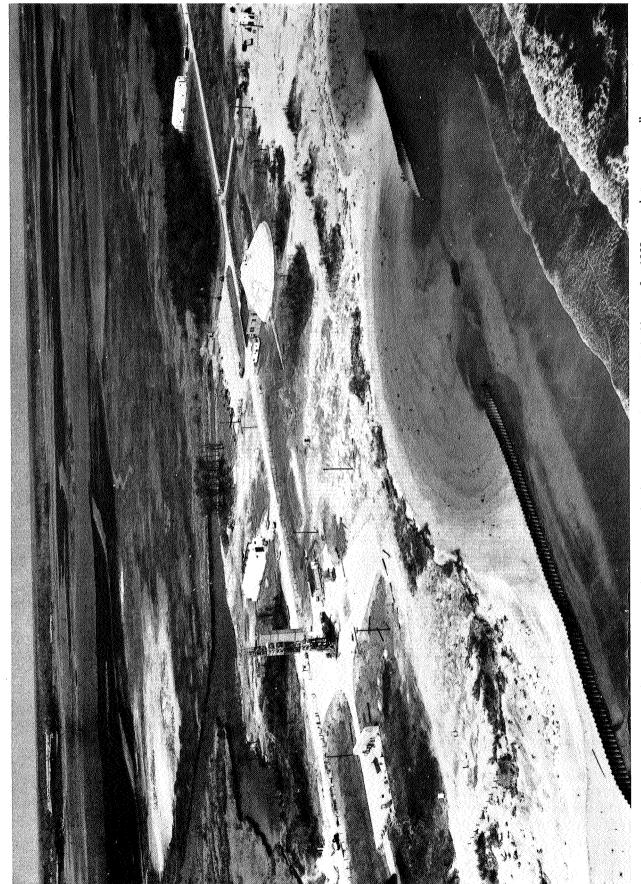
Aerial view of Launch Area No. 3, showing Scout launch tower and blockhouse after 1962 storm damage to seawall.
